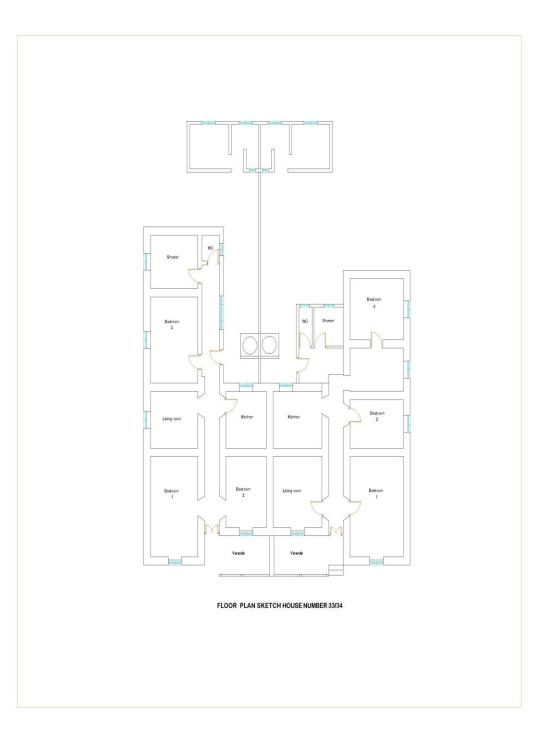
SKETCH OF FLOOR PLAN HOUSE NUMBER 33/34
